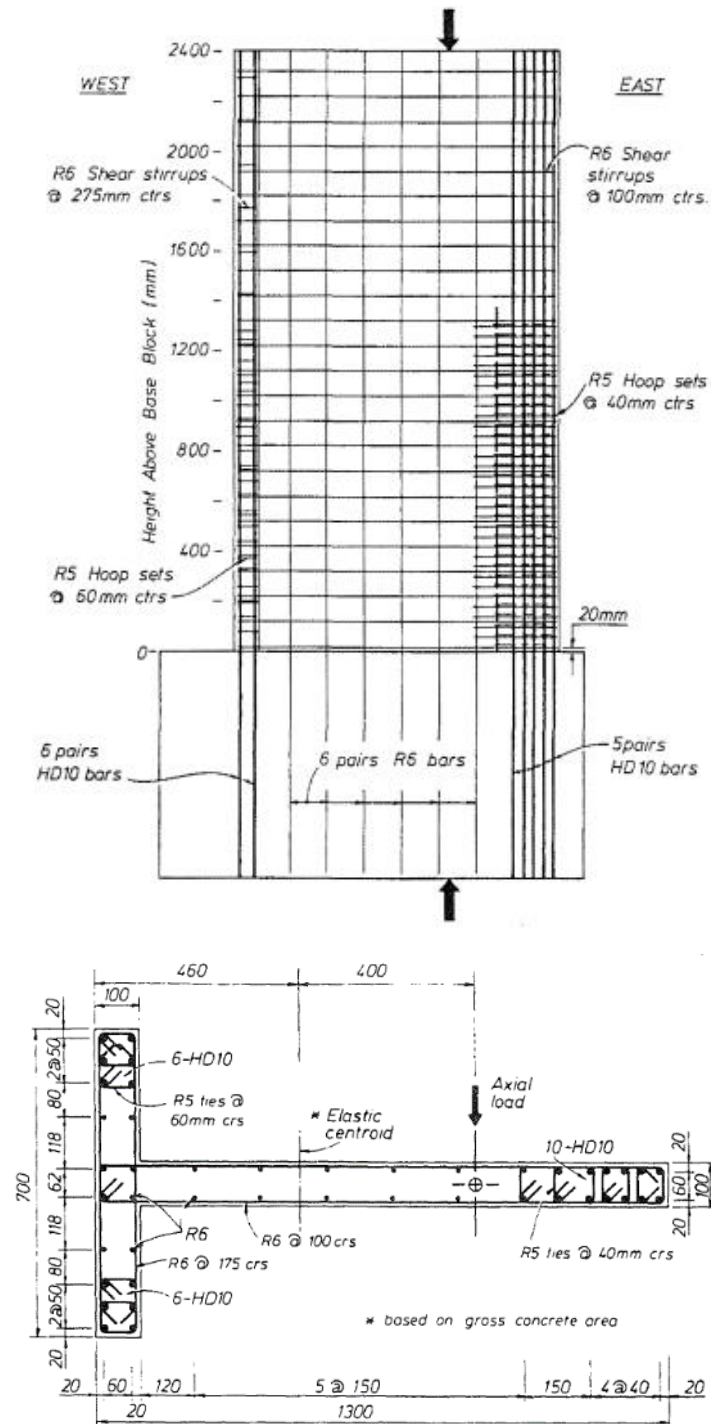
Test Specimen Geometry and Reinforcement Details for Paulay & Goodsir [143]
